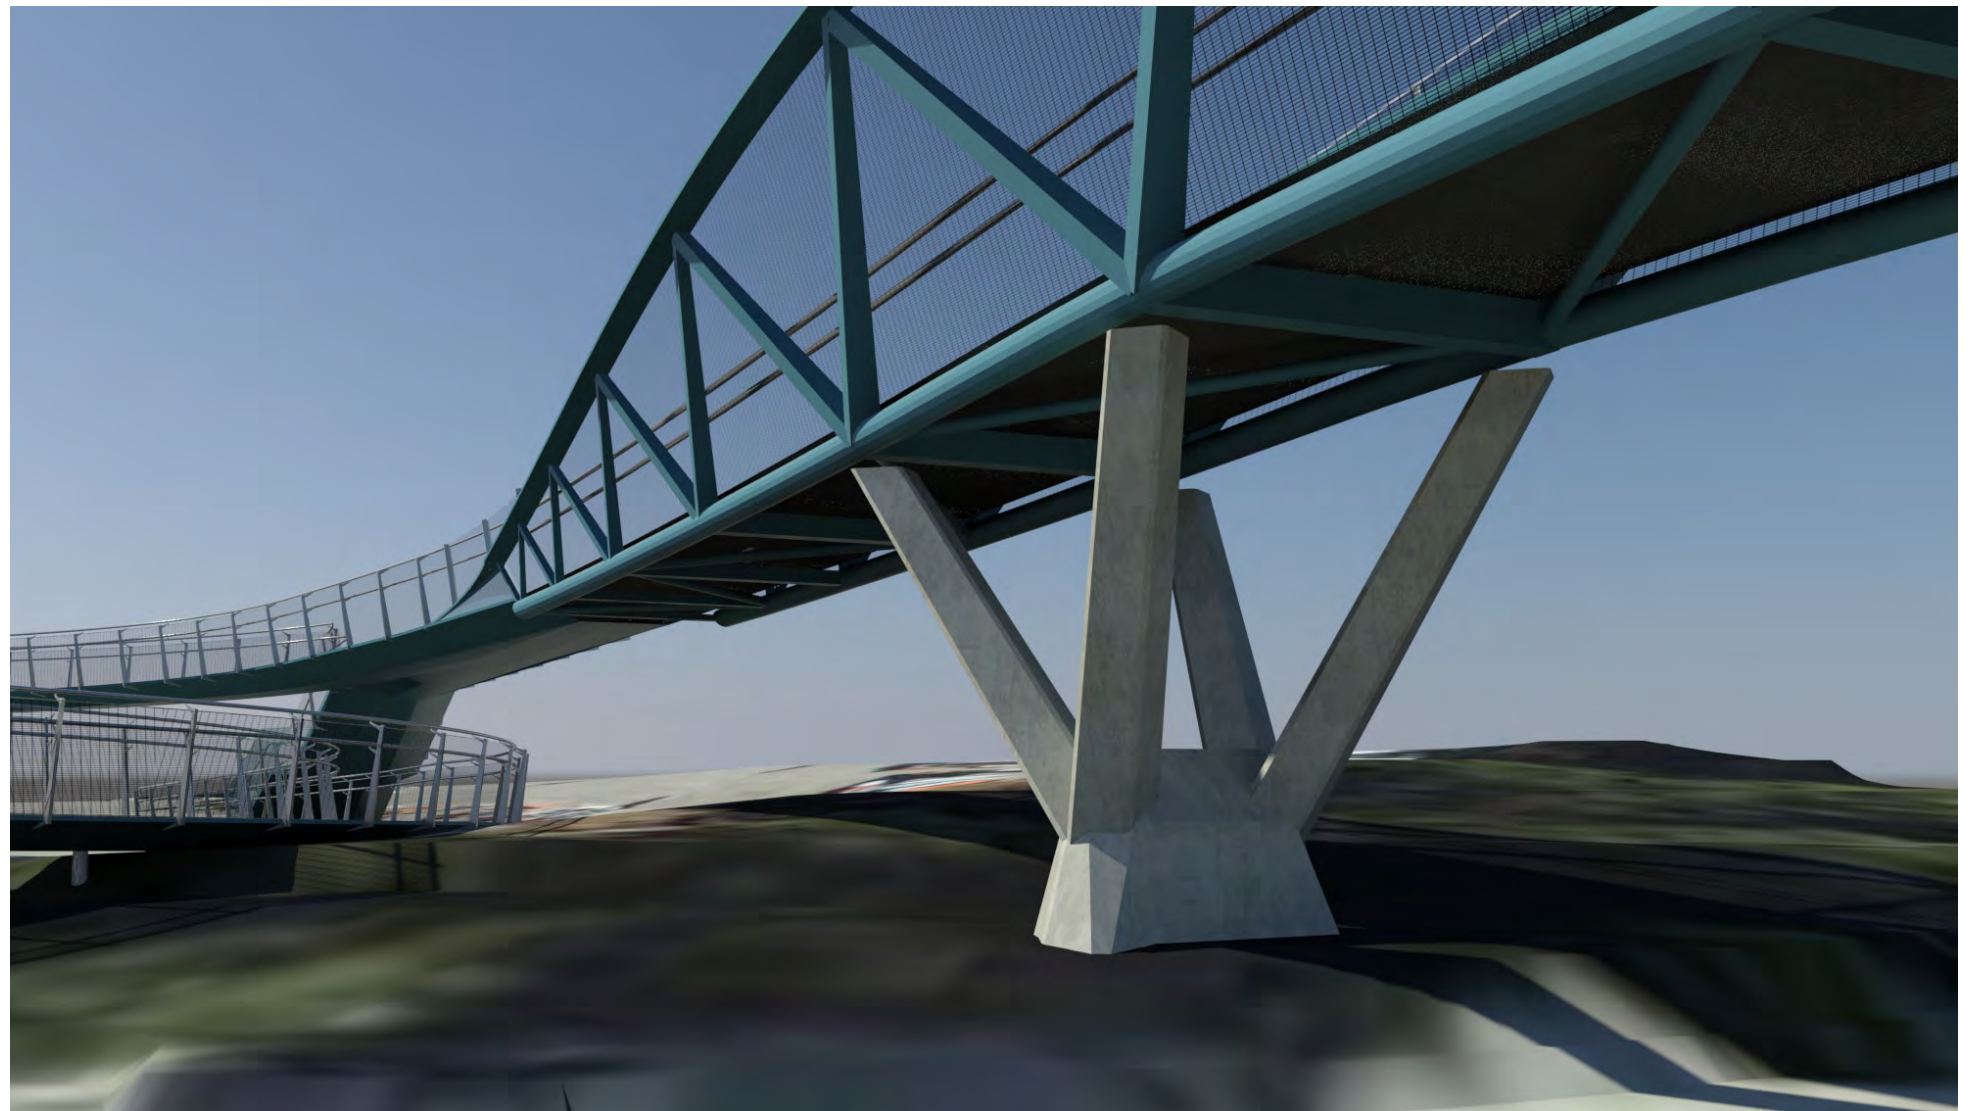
Abstract 3D study of the pier configuration. The "V" shape form echoes the truss language and the diamond shape of the piers visually relates to the top truss chord and diagonals.
